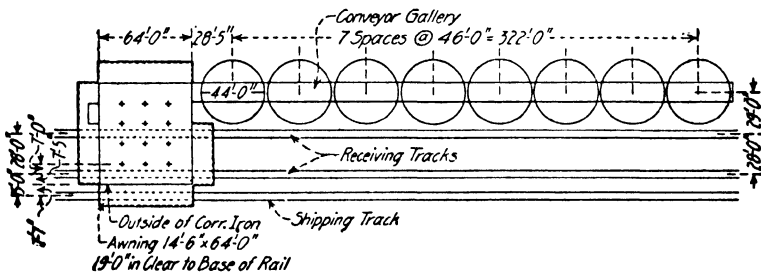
PLAN OF INDEPENDENT ELEVATOR.
